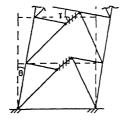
K - braced EBF Fig. 1b Deformed EBF
